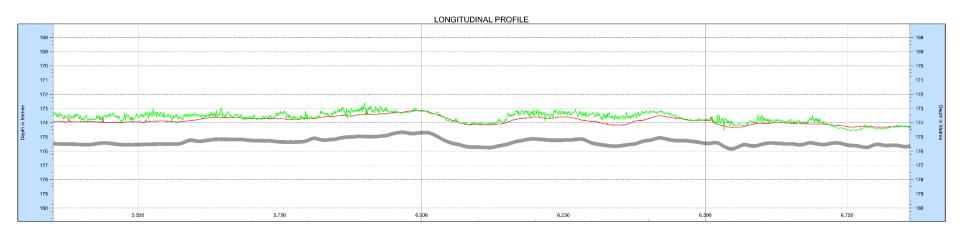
PL4556 As-built alignment sheet KP5.351 to KP6.861
